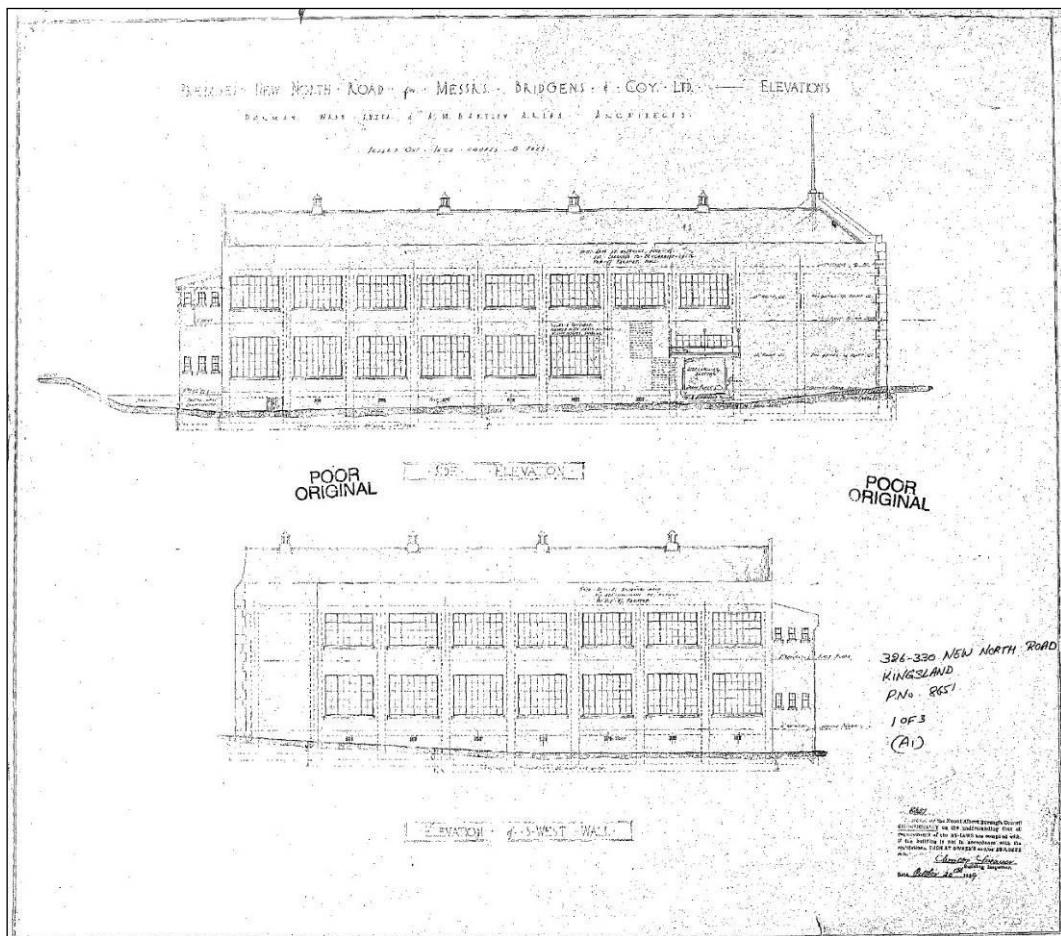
1929 Drawings for 'Premises New North Road for Messrs Bridgens and Coy Ltd' - by Wade and Bartley Architects: West and East Elevations. Auckland Council Filenet. Accessed October 2016.
